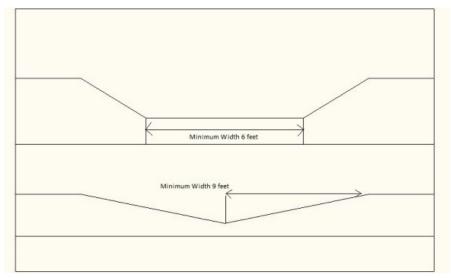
Single Ditch with Trapezoidal and V-shaped Cross Sections.
